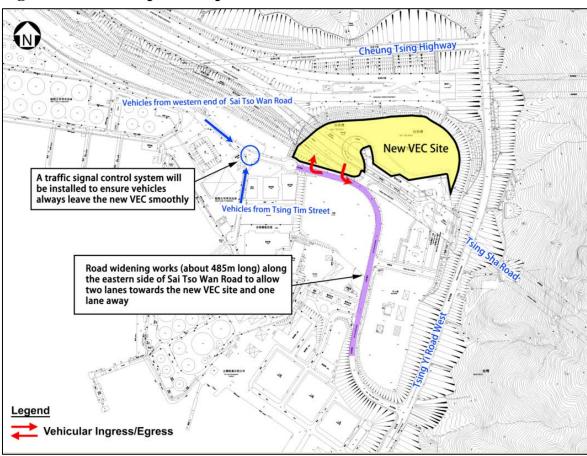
Proposed Improvement Measures at Sai Tso Wan Road
